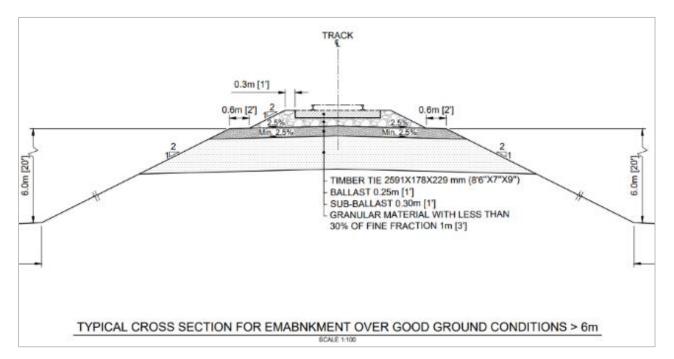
Typical Cross Section for Embankment over Good Ground Conditions
